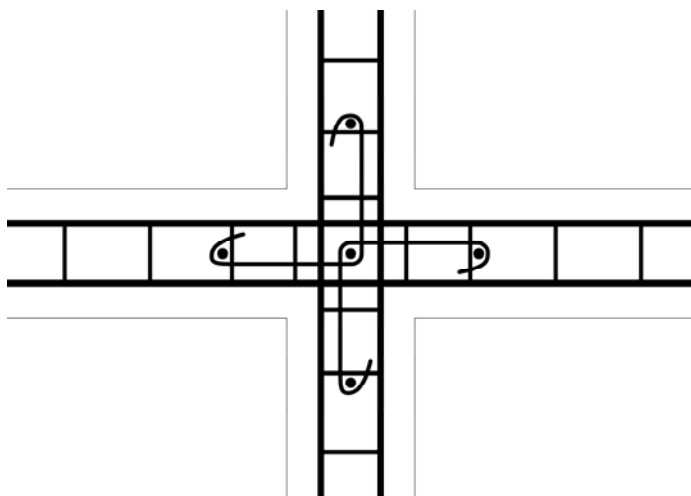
Detail of reinforcement in a 4 way crossing of walls (Sill beam)
